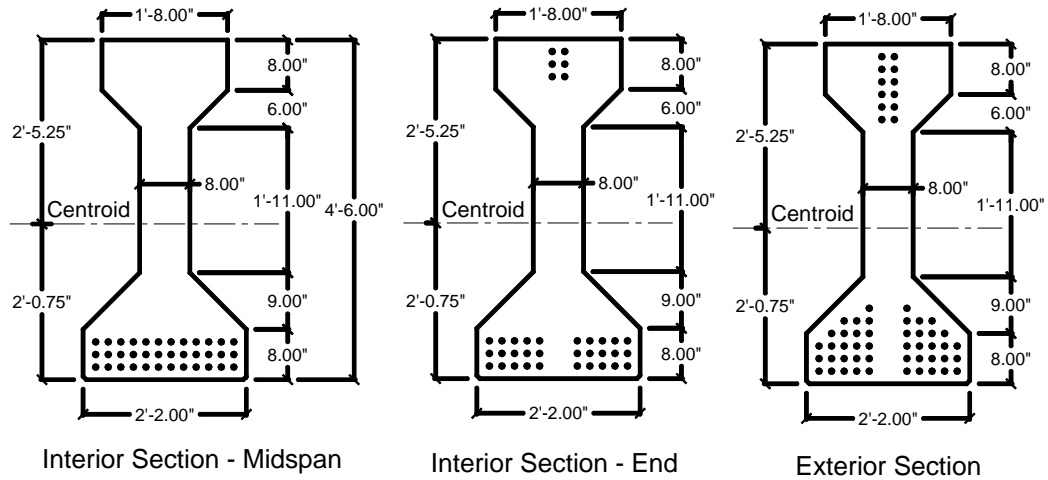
Type C Girders – Lampasas River Bridge
